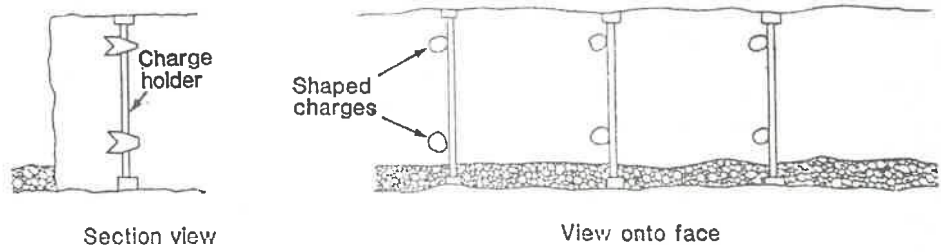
AN ENVISAGED LAYOUT USING CONICAL SHAPED CHARGES FOR ROCKBREAKING WITHOUT DRILLING
